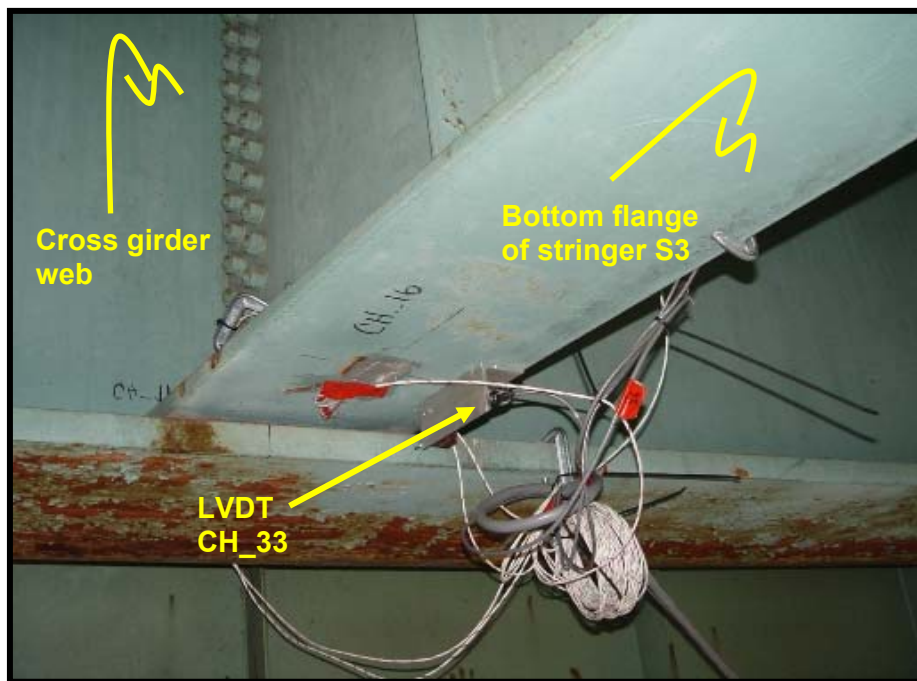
LVDT CH_33 installed to measure the relative displacement between the bottom flange of interior stringer S3 and the bottom flange of the cross girder.
